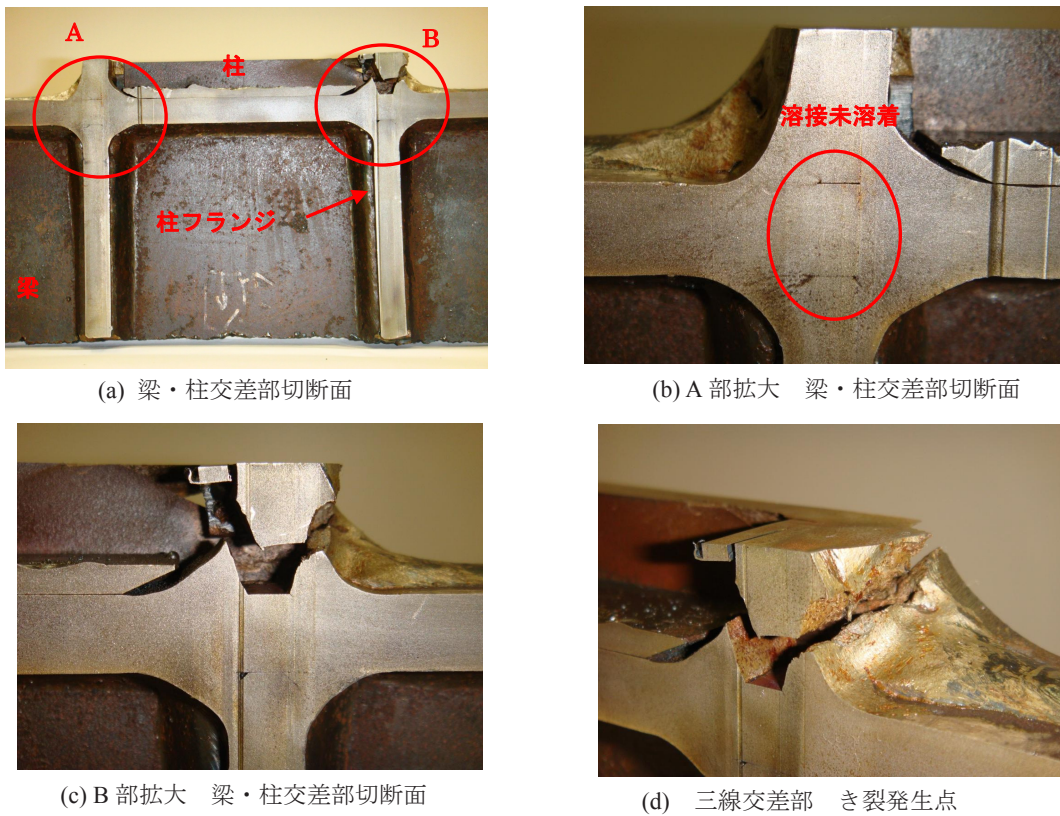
Cut off picture of S25-5-VC at beam-column connection
